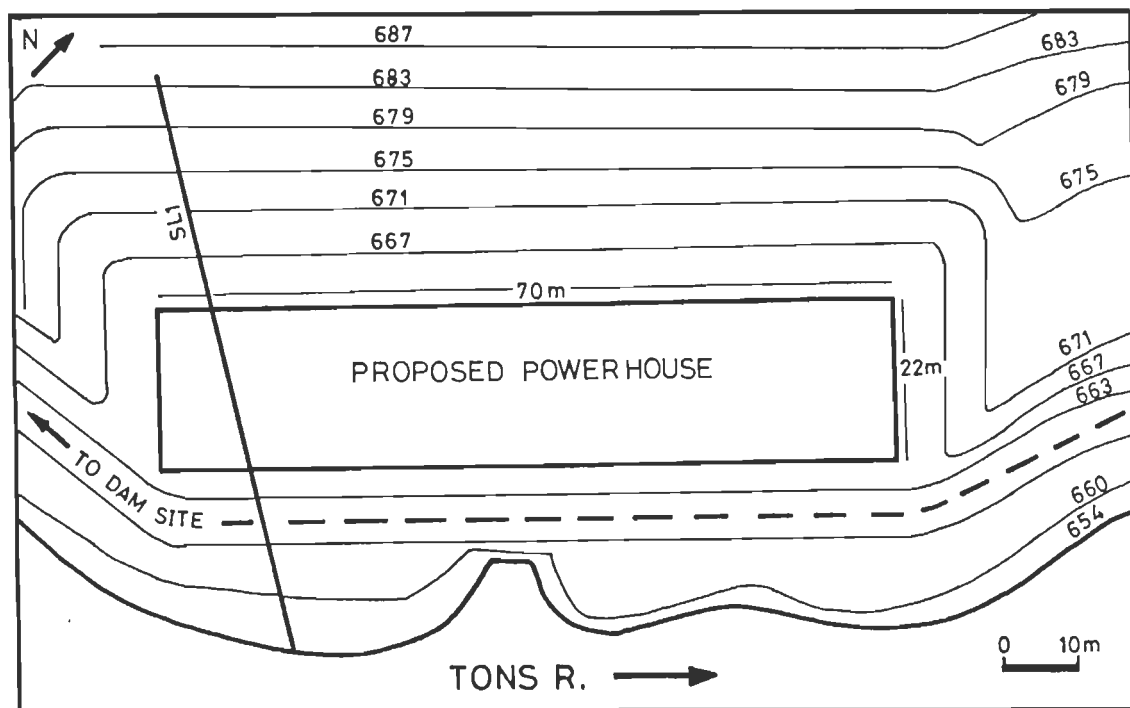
CUT SLOPE DESIGN (IN PLAN) FOR POWERHOUSE SITE.
